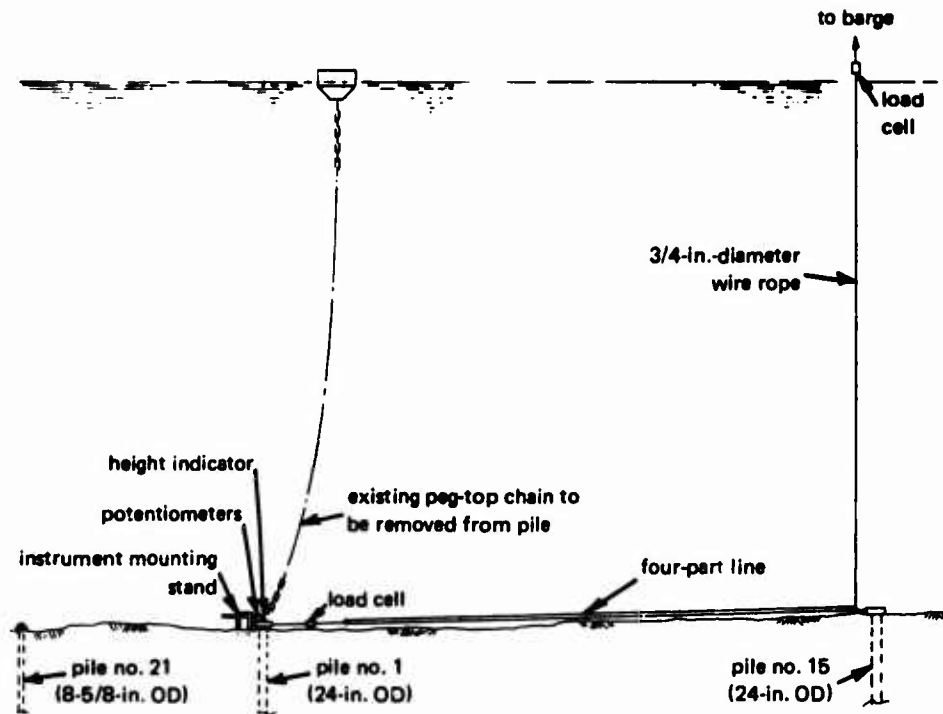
Pop-Up Site pile load test. (After Sutton, 1969.)
